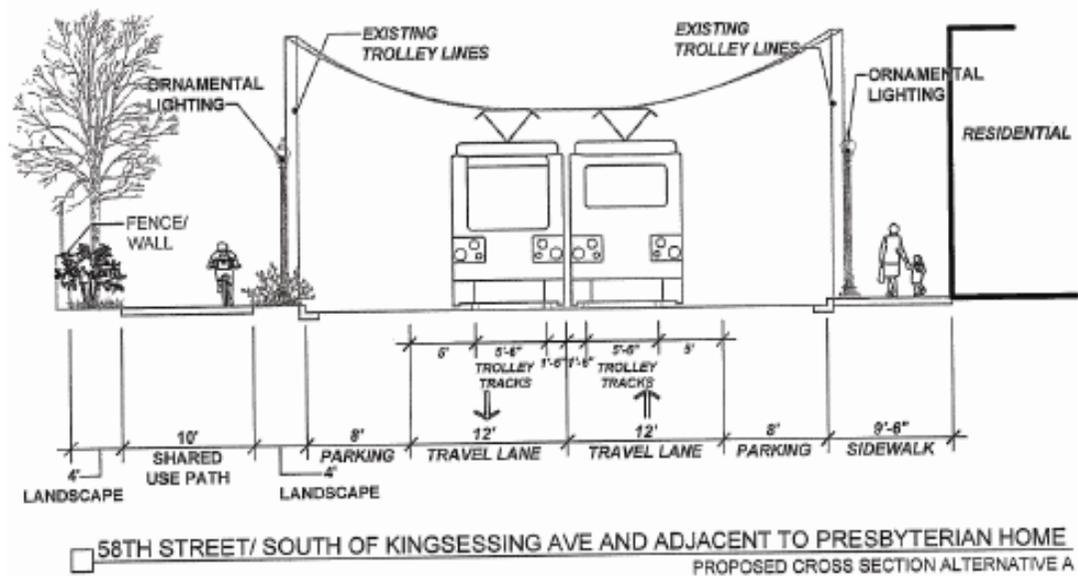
Proposed Cross-Section for 58th Street Greenway
